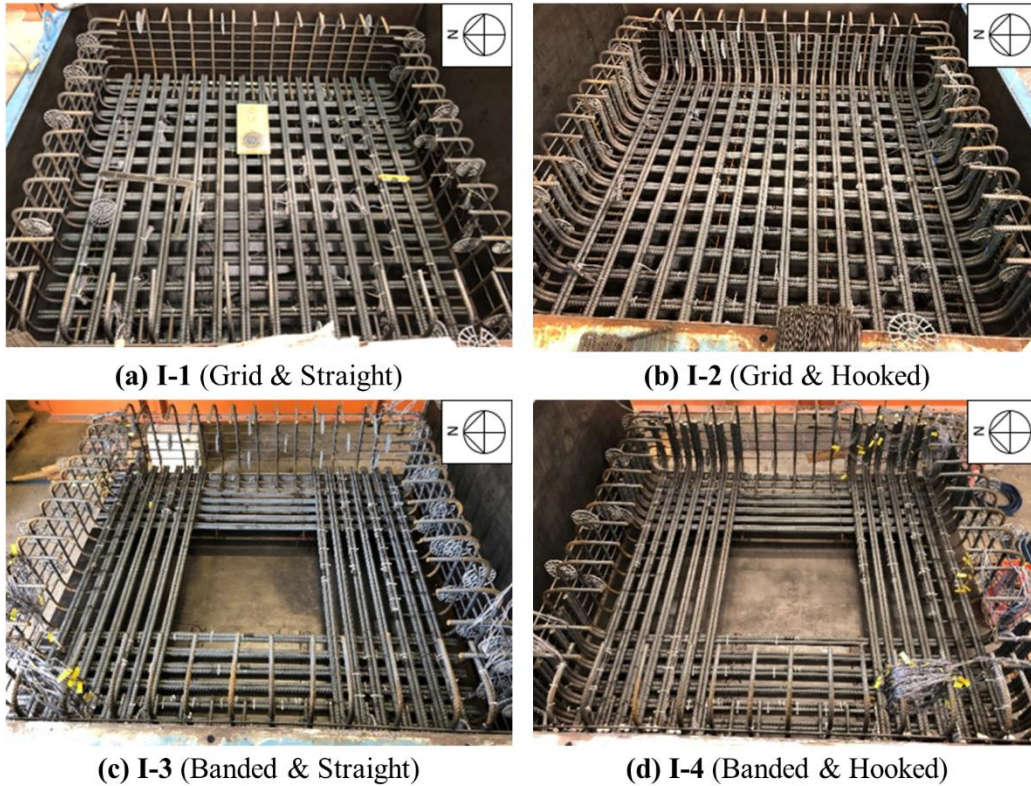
Bottom mat reinforcement configuration and anchorage of specimens in Series I
